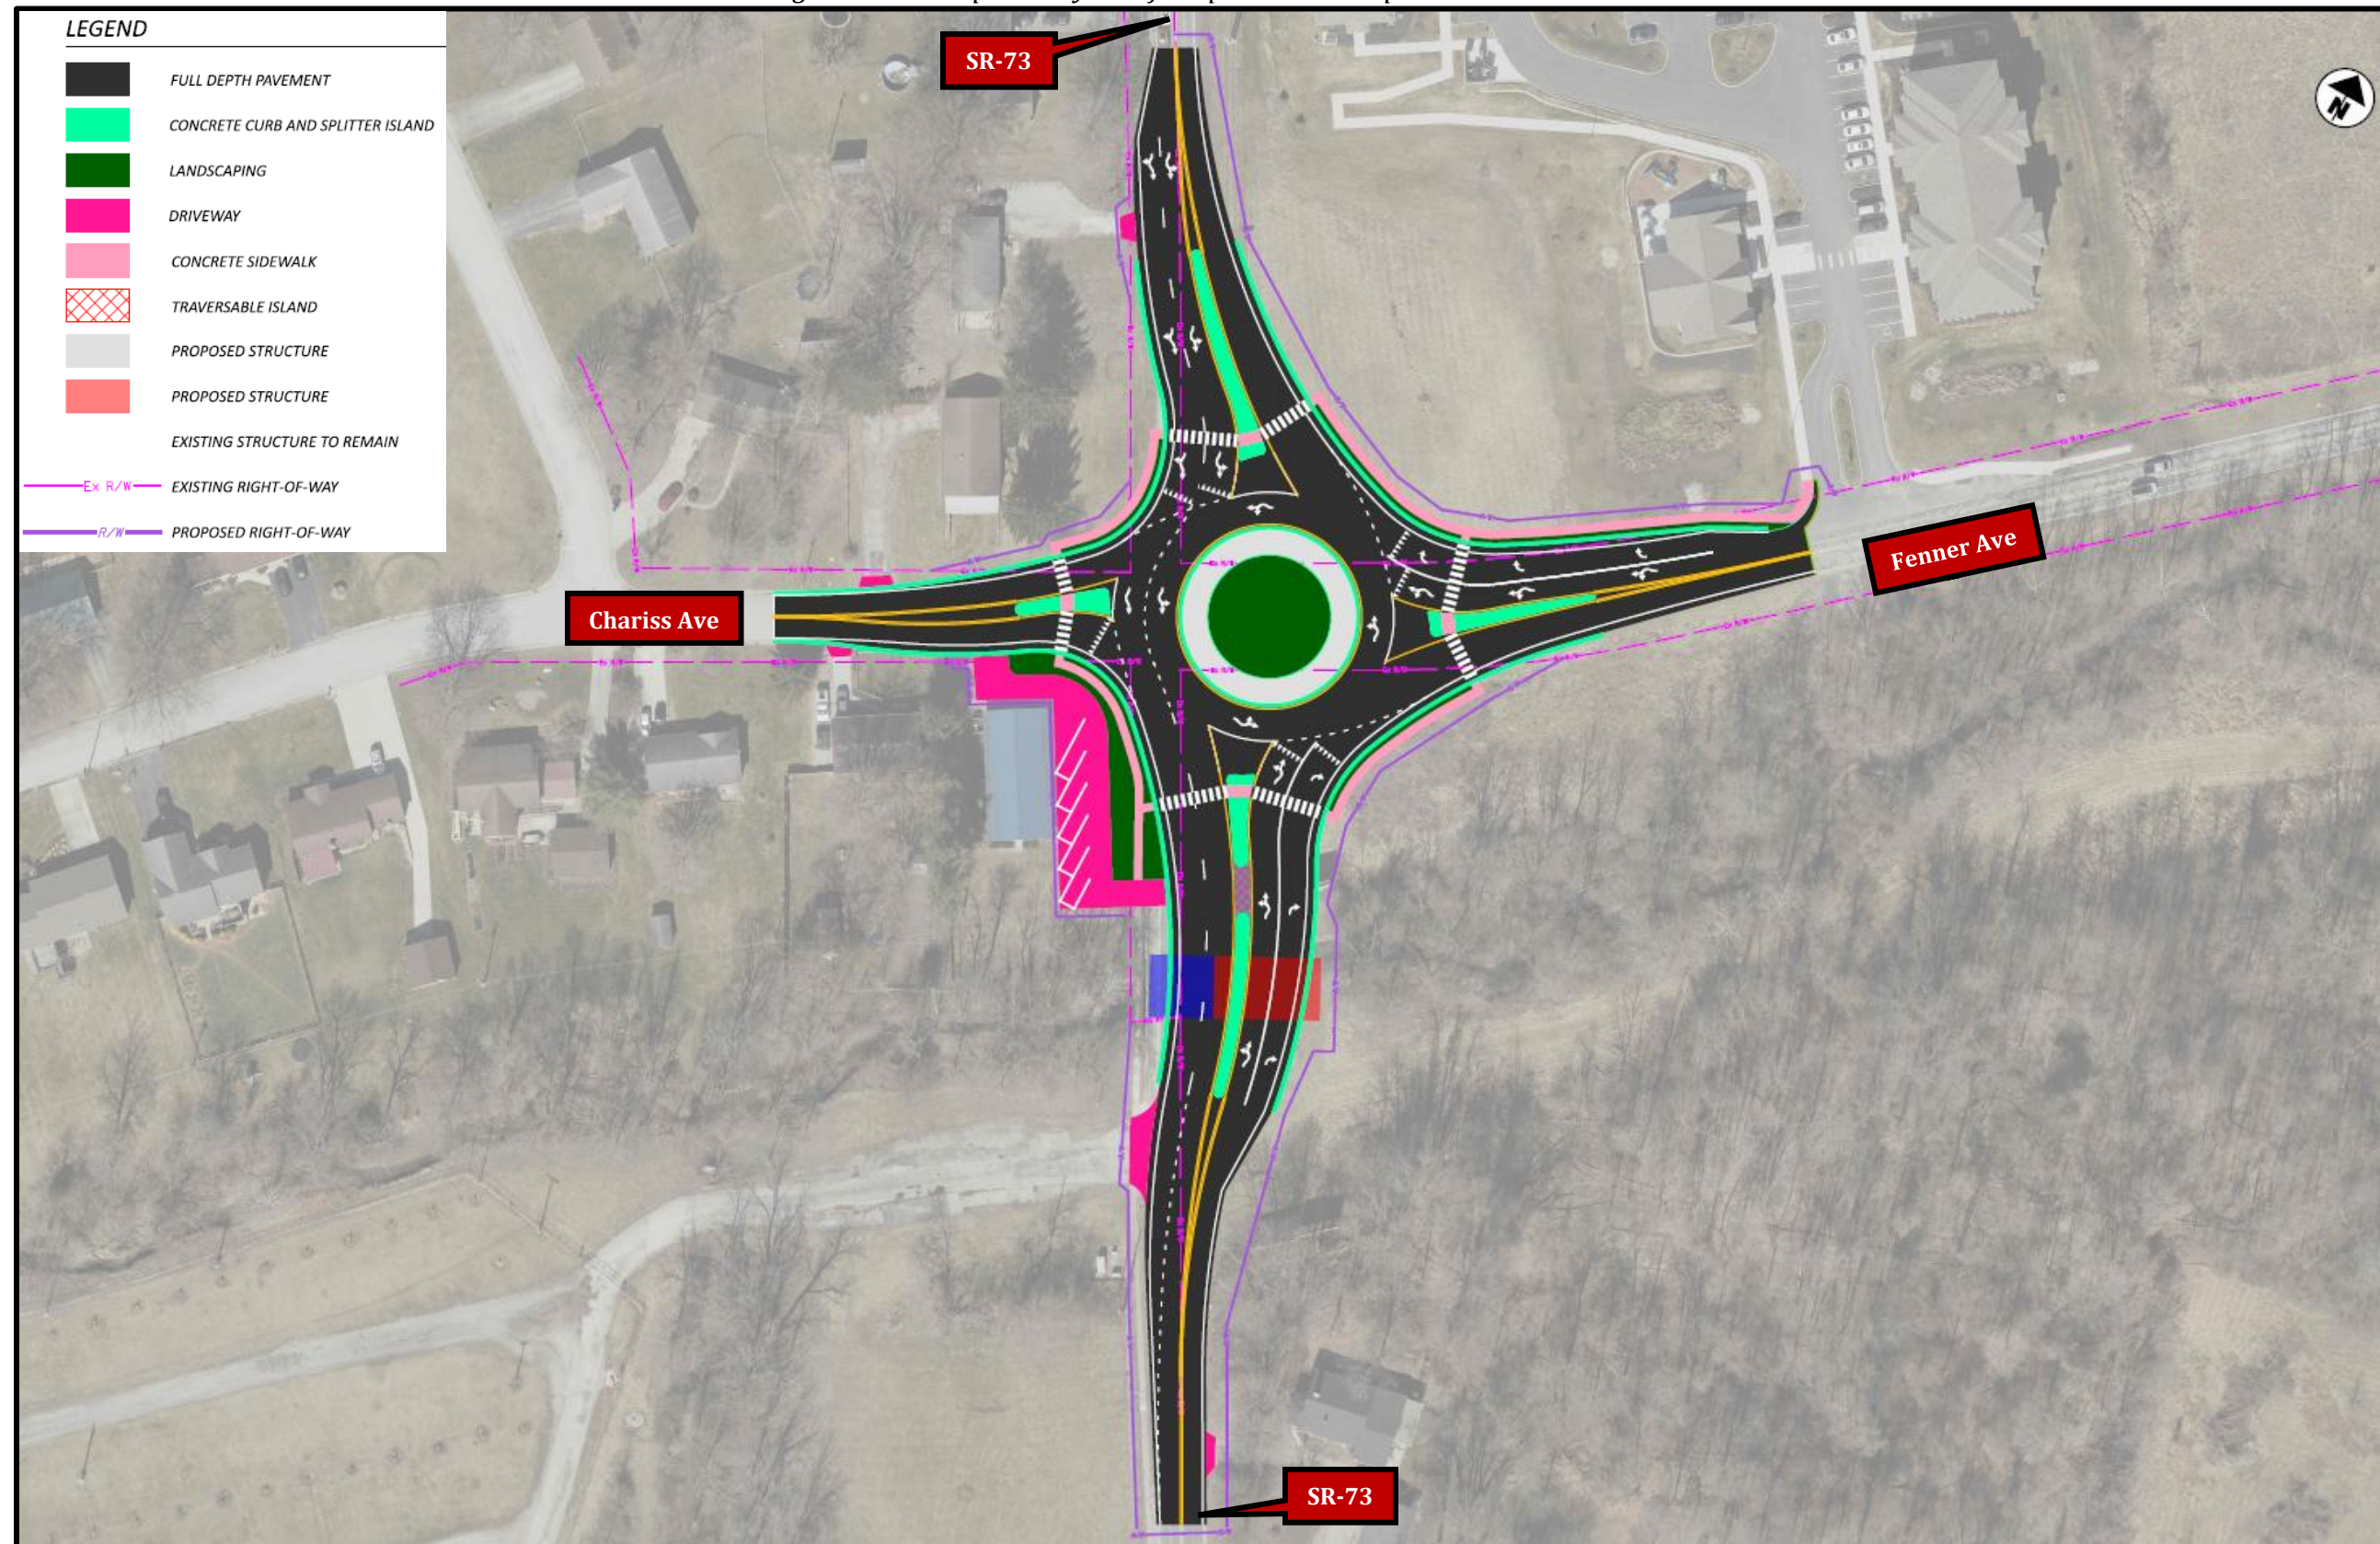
Conceptual Layout of Proposed 2045 Expanded Roundabout
